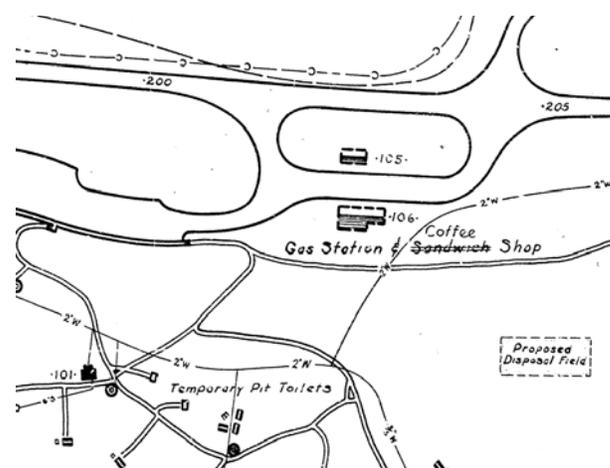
Proposed Gas Station and Coffee Shop locations as indicated on Utility Layout Plan, 1943.
